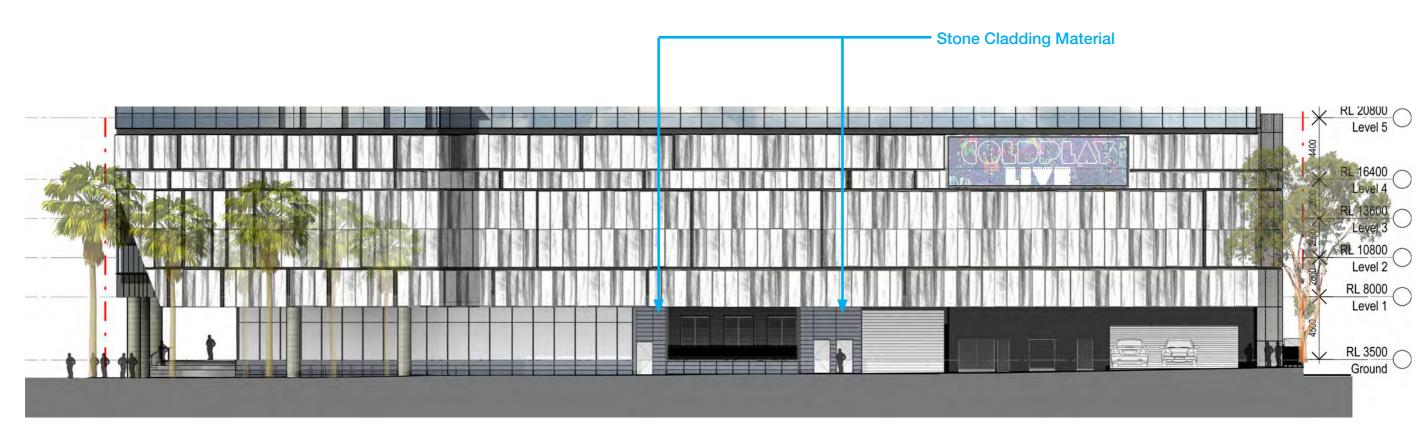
Proposed North Part Elevation Nominating Stone Material
